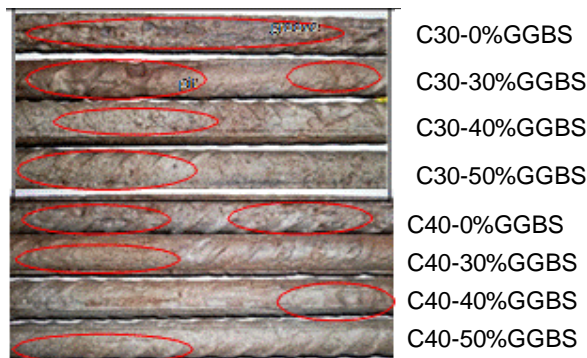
Shows the corroded reinforcement steel for all mixes
